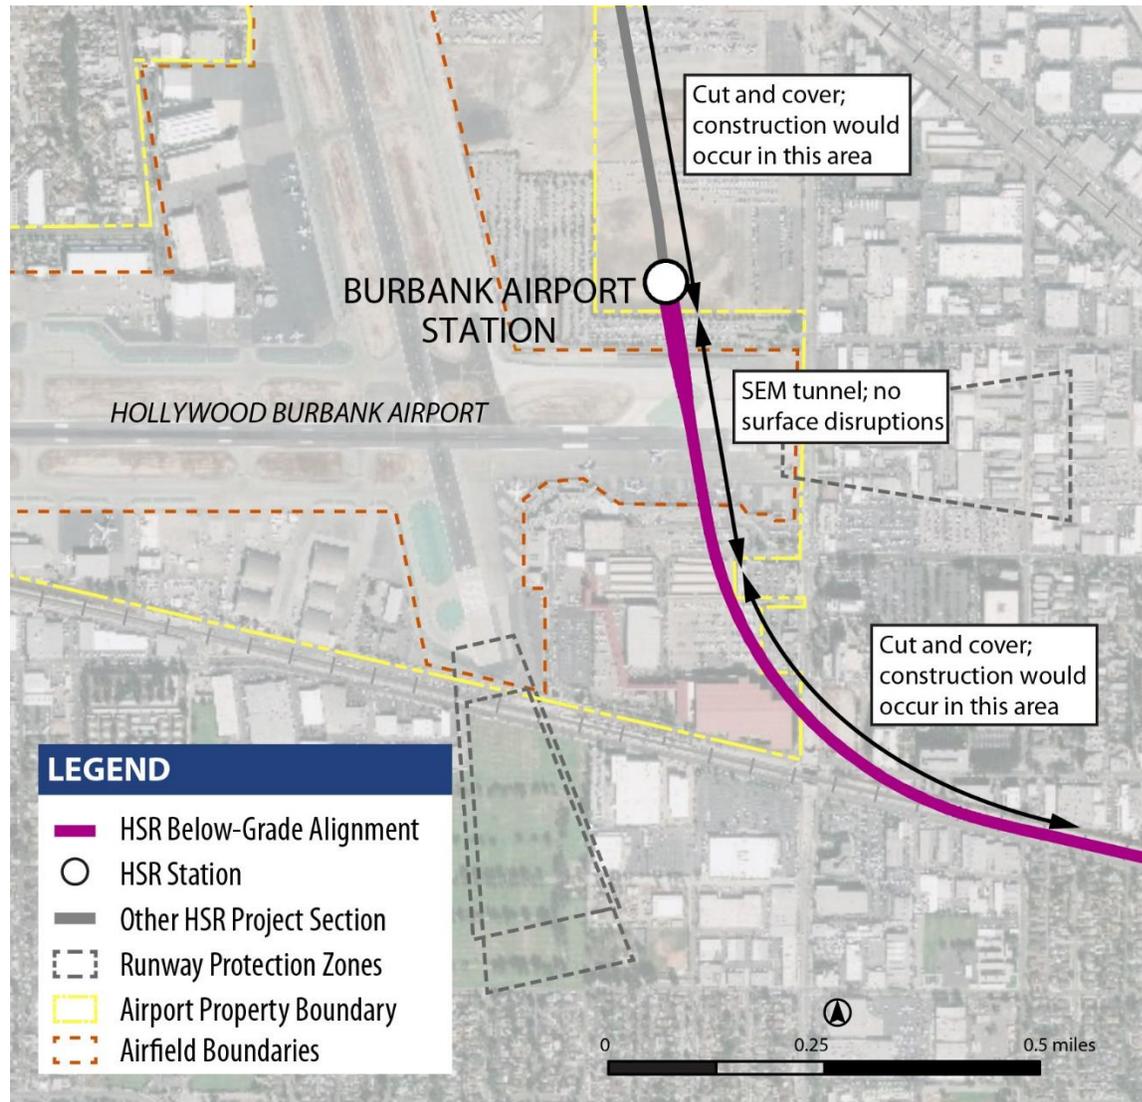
Tunnel Alignment beneath Hollywood Burbank Airport Runway
